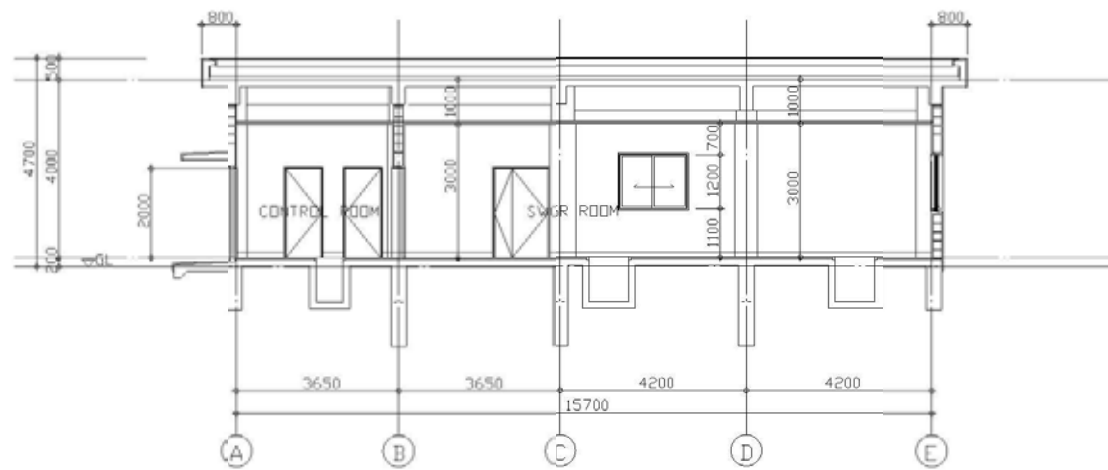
Elevation Plan of Mwanyanya Substation Control Building (North and West)
